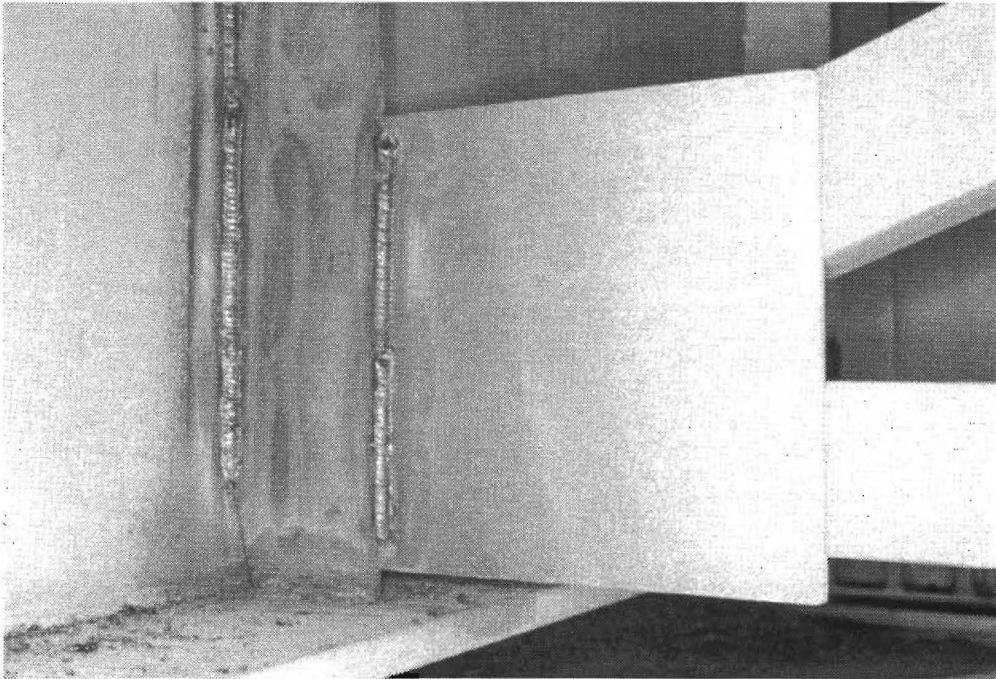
View of replacement cross-frame diaphragm with welded connection plate.
